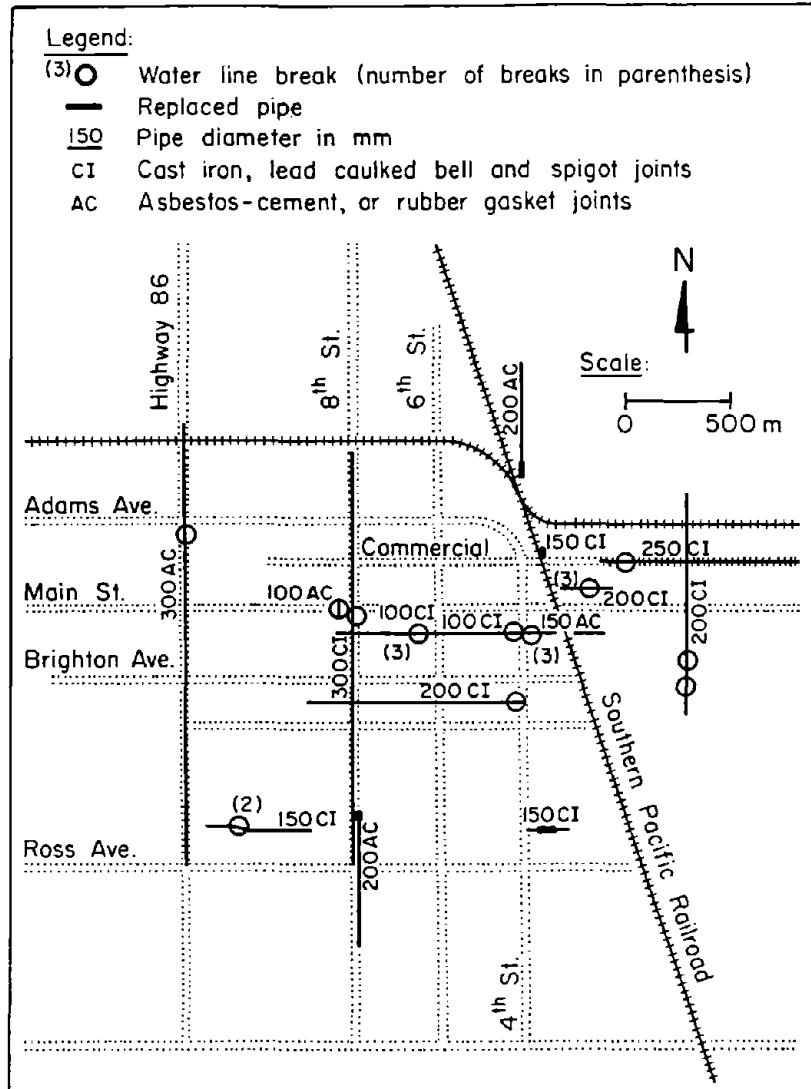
Plan View of the City of El Centro Showing Repaired and Replaced Water Lines
